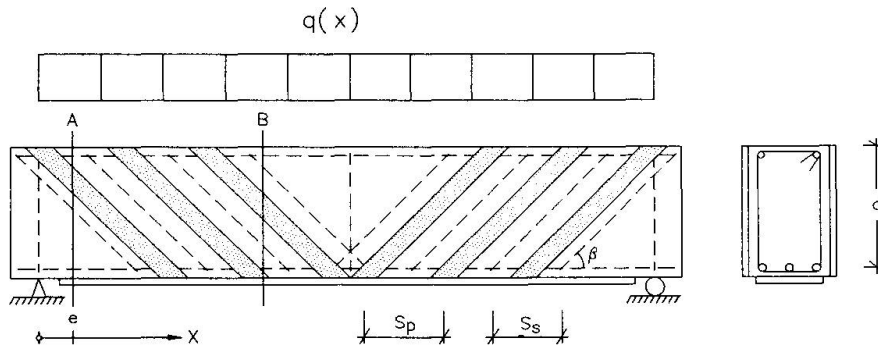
Strengthened concrete beam with a distributed load $q(x)$
